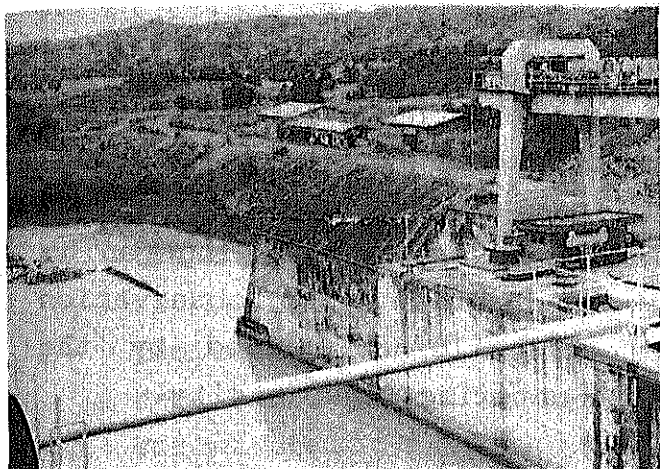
Cracks on the revetment of the Masiway Dam
